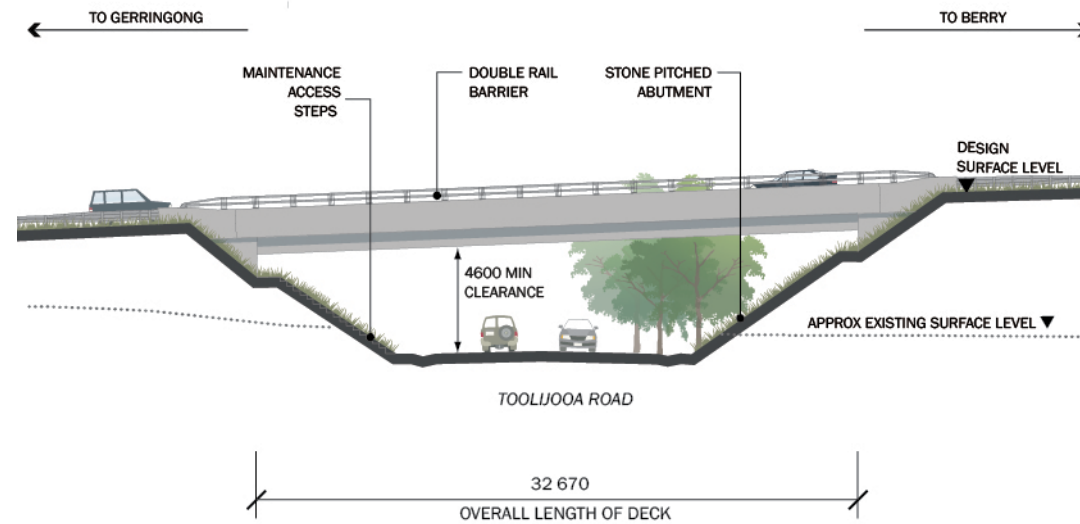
Elevation – Bridge SB01: Toolijooa Road Underpass (Scale: 1:400@A3)
